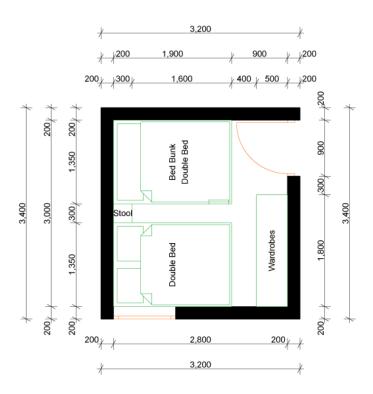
Two Bedroom, Bedroom, Furniture Layout Two
